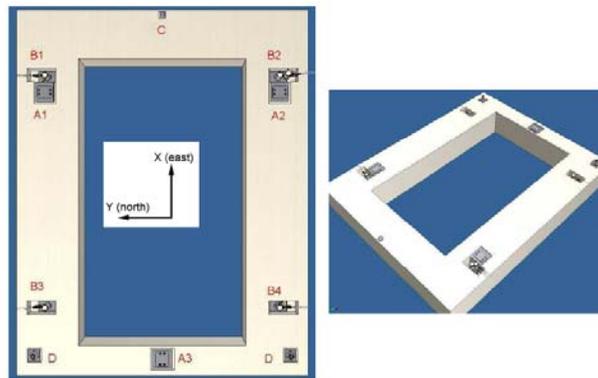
Enclosure foundation showing interface points: A = the fixing plates, B = relocation jacks, C = grounding plate, D = alignment plates. (Courtesy of EIE).
